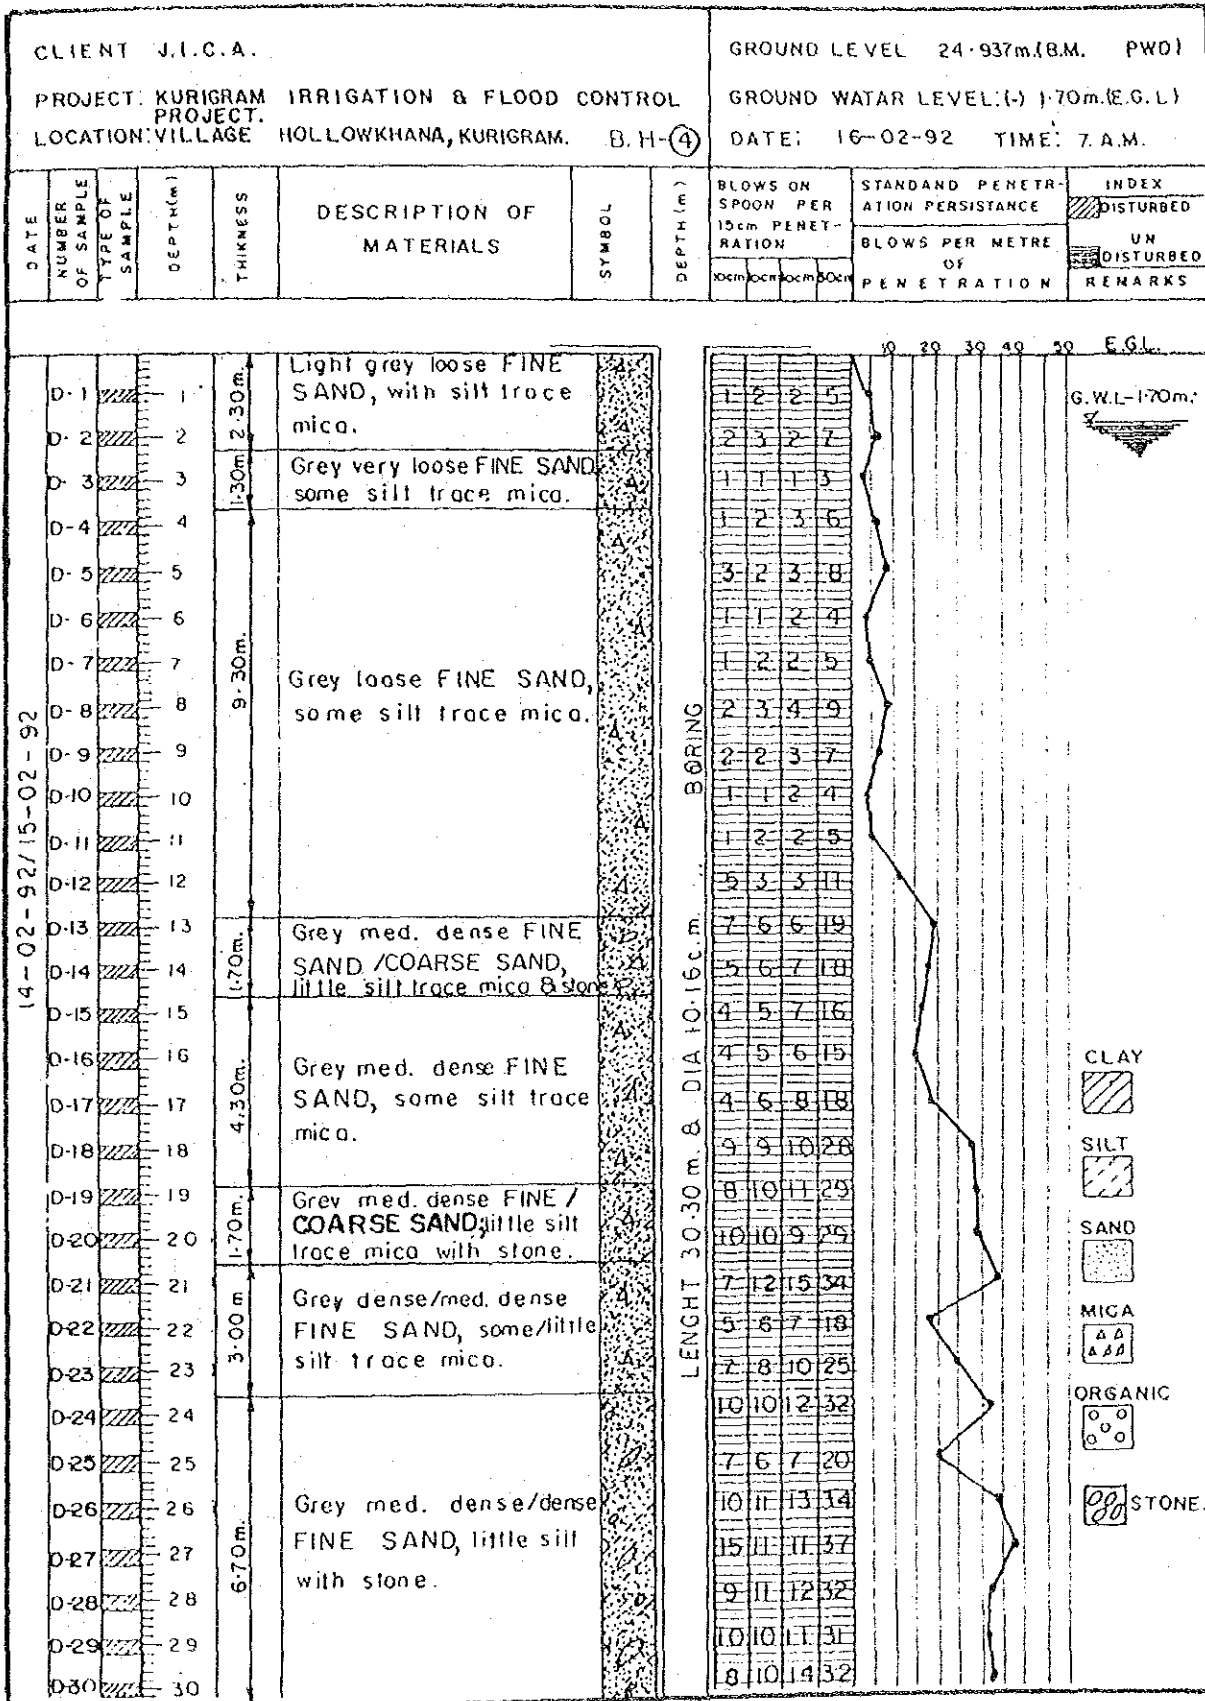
PROPOSED PUMPING STATION SITE (6/8)
